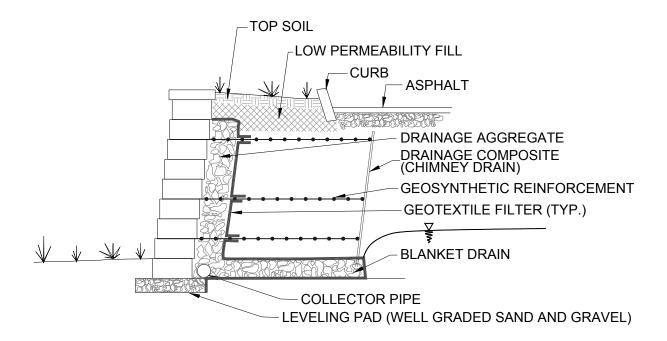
Example drainage detail using a blanket drain with chimney drain (Collin et al., 2002).
